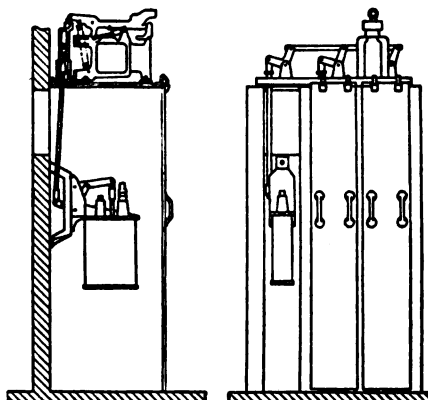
TYPE F-22 MULTIPLE SINGLE POLE BREAKER ARRANGED FOR CELL MOUNTING WITH MECHANISM ABOVE BREAKER
